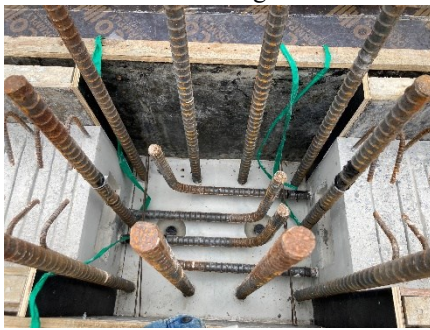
Construction procedures of beam-column connection specimens: PC member construction
